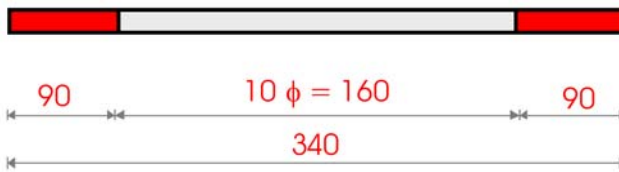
Geometrical data of the specimens for the cyclic loading tests (dimensions in mm).
